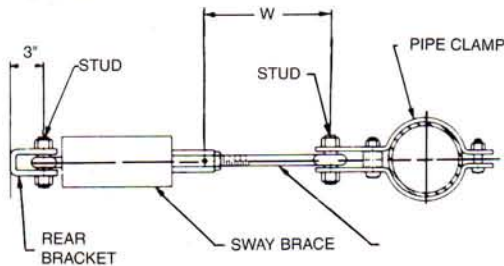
, recommended when W dimension is 2 ft 0 in. or less
